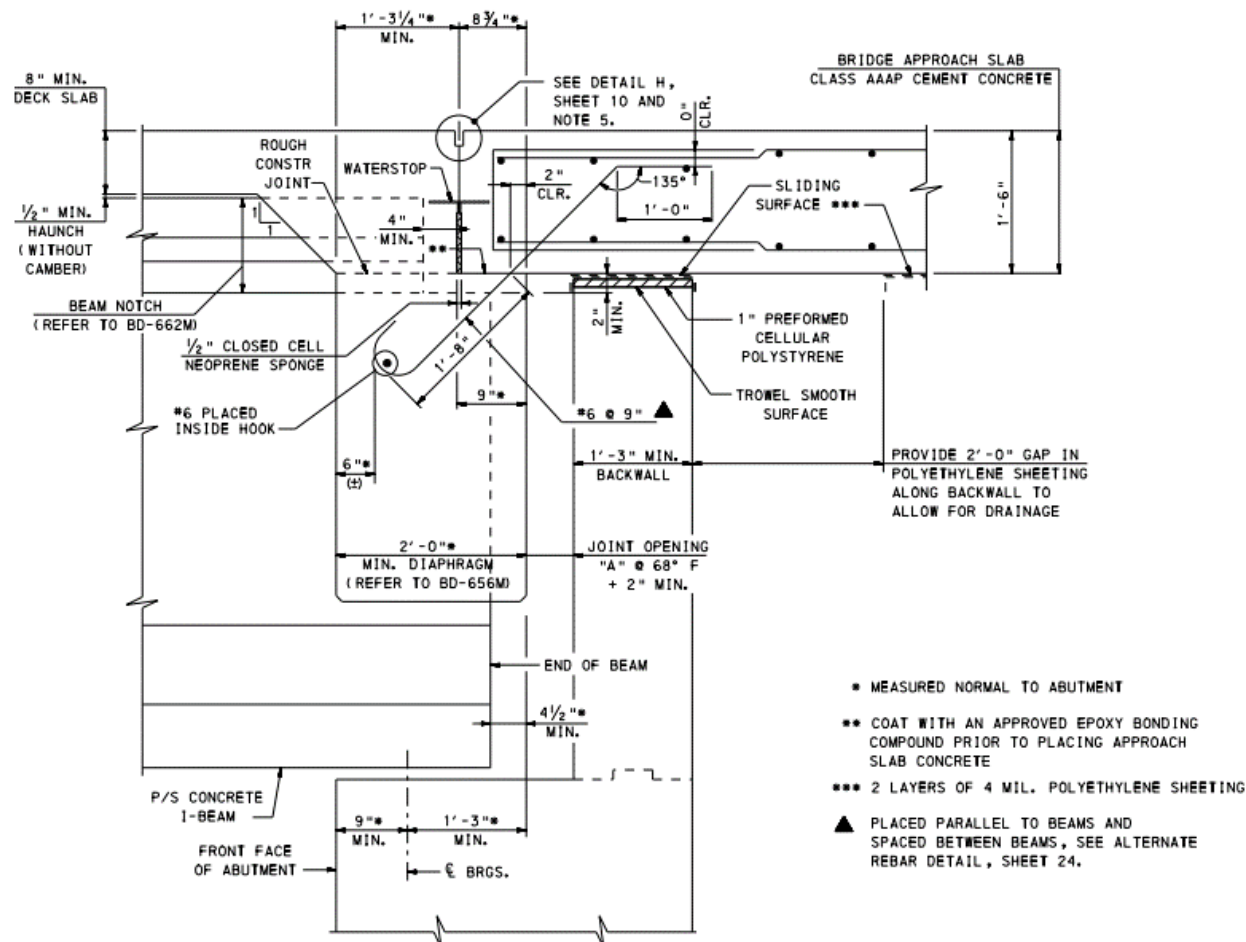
Example of an Abutment Supporting a Deck Slab and Approach Slab (Taken from PennDOT BD-628M)
